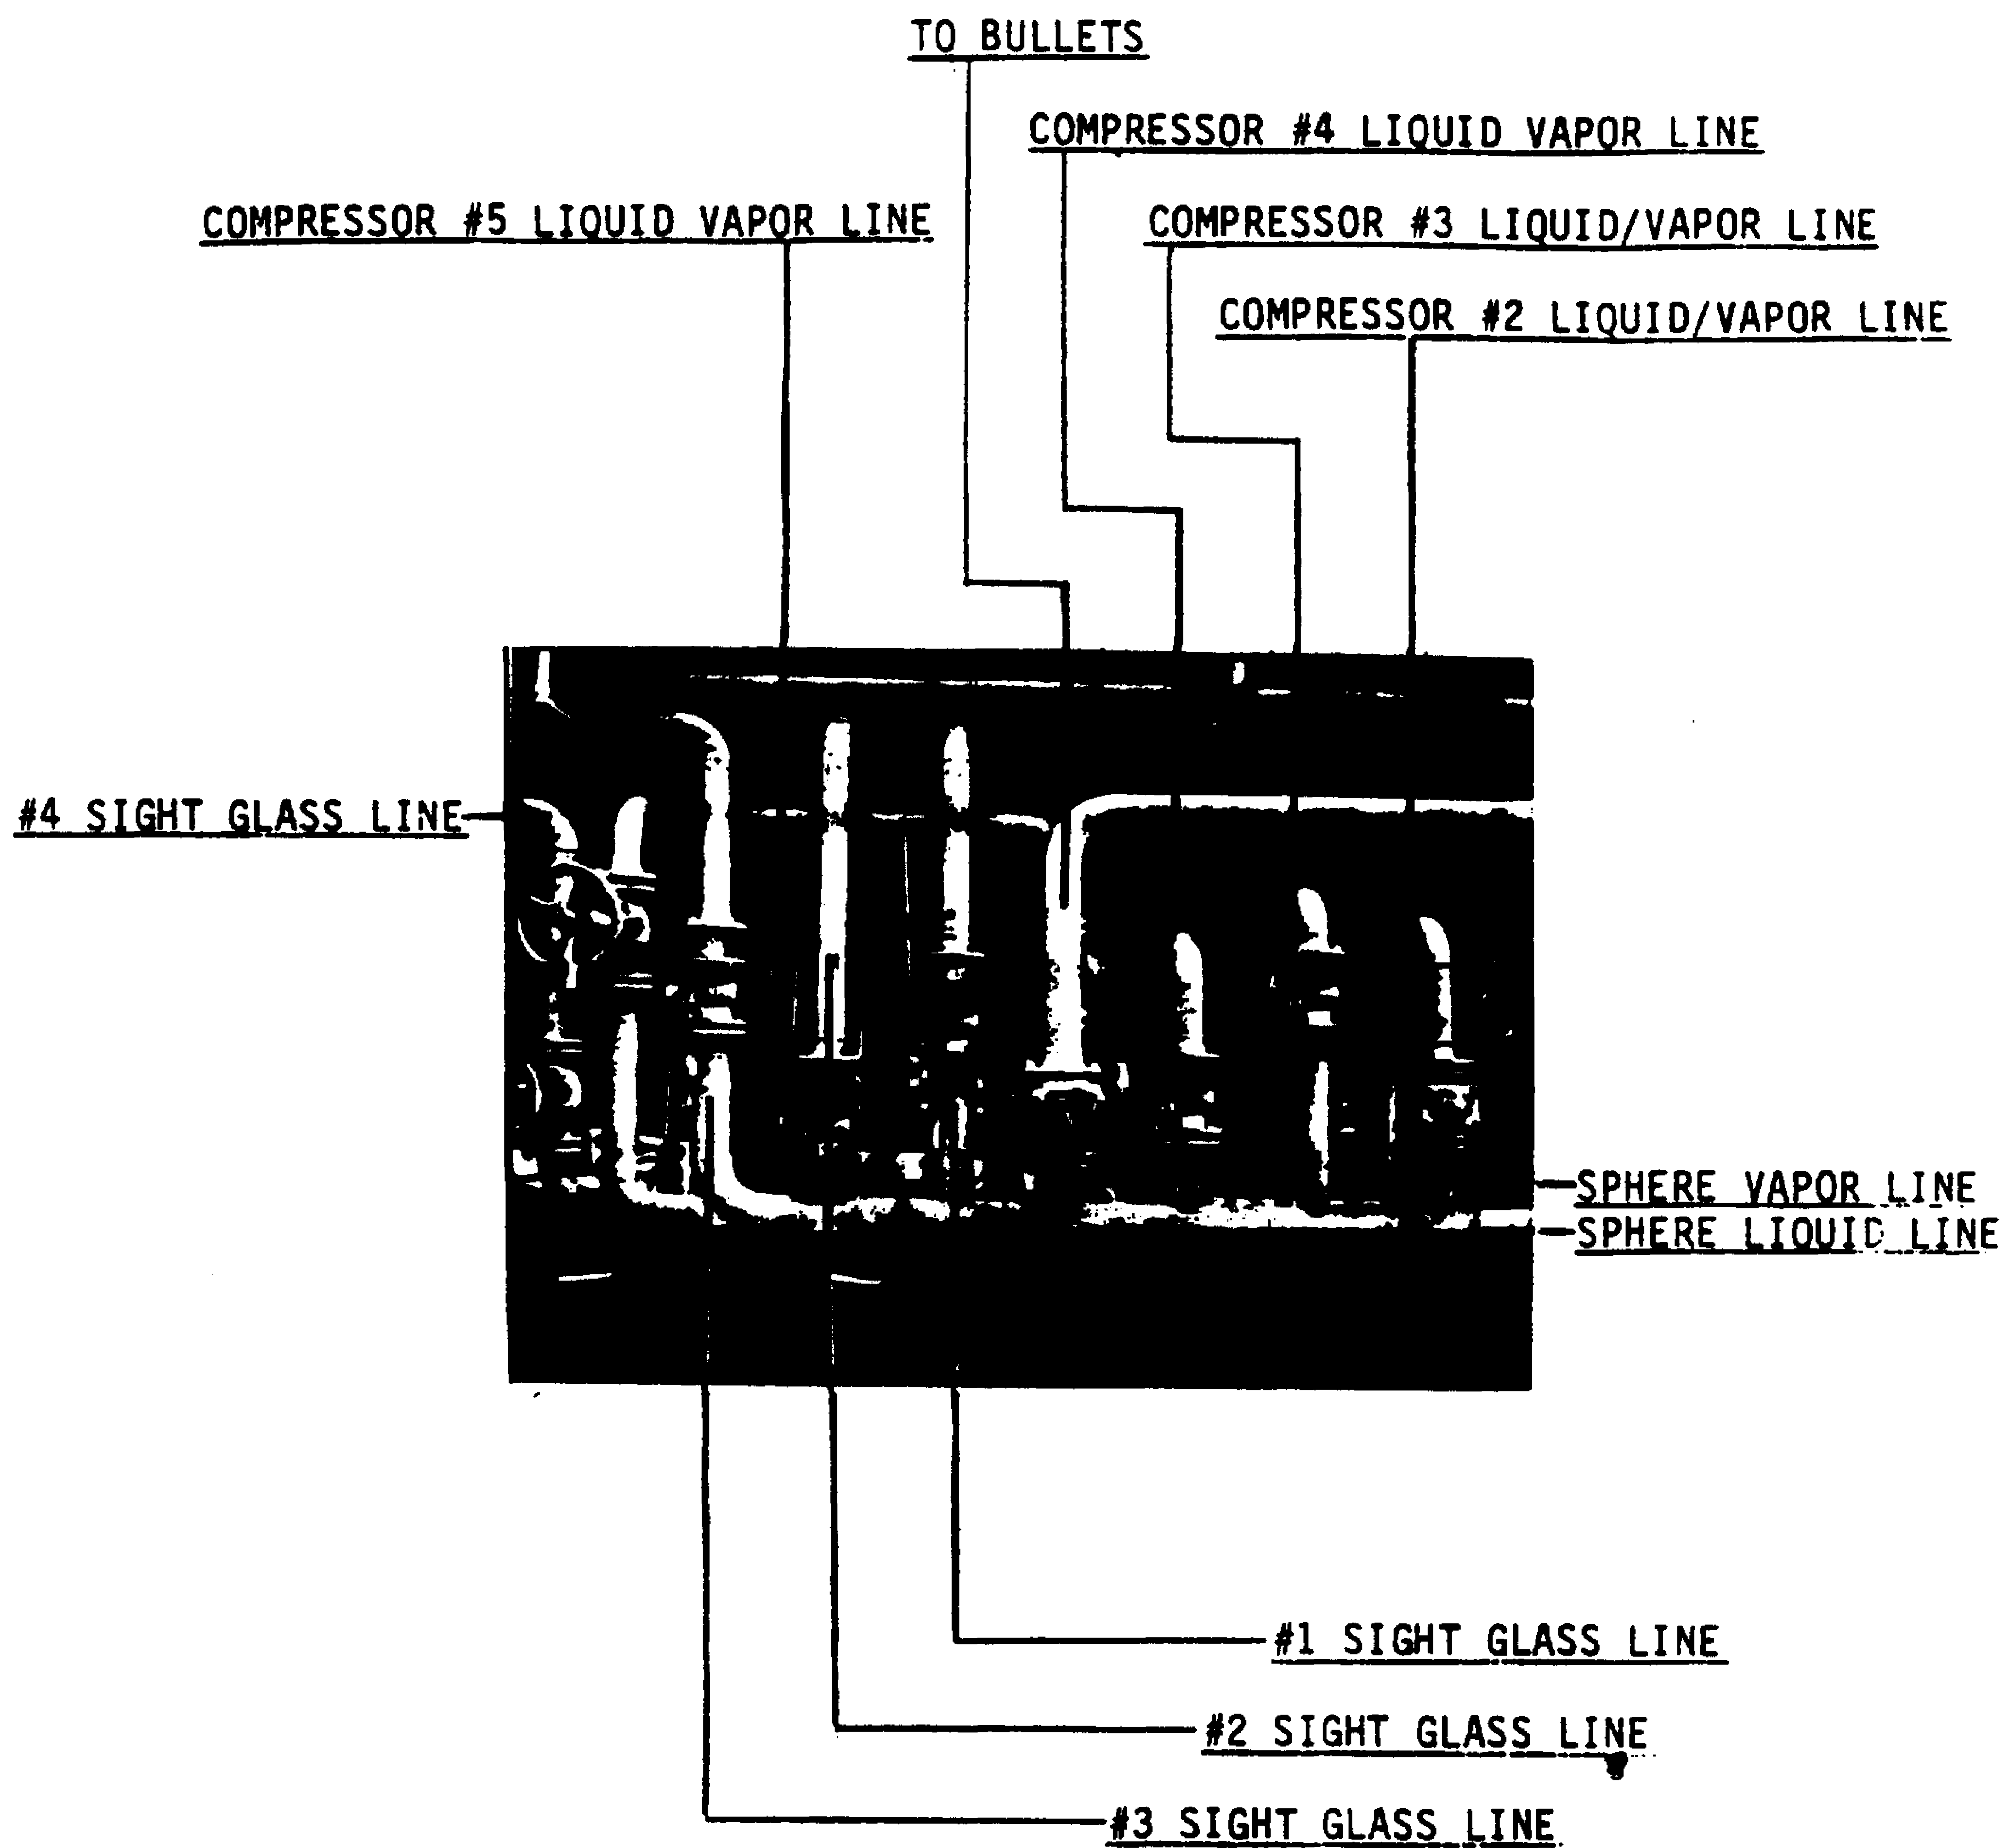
PIPING AND VALVES ON WEST SIDE OF THE COMPRESSOR SHED
